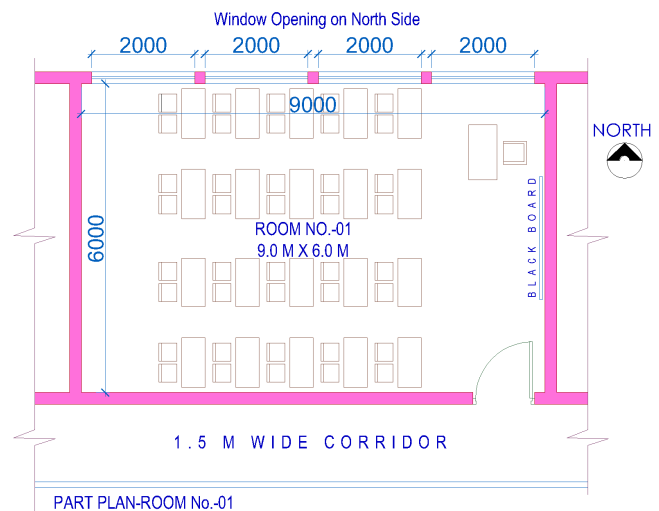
Plan of Room No.1 with a north-oriented opening.
